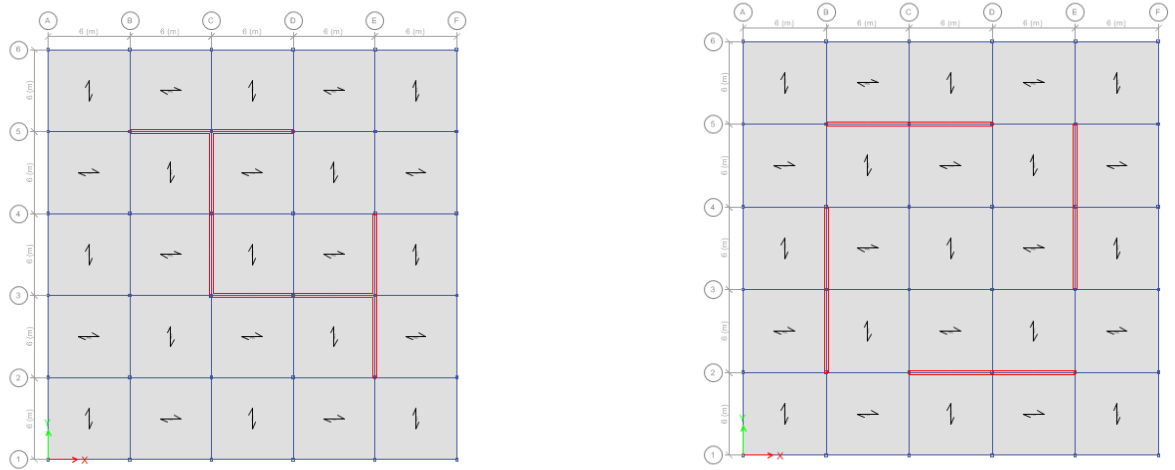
Placement of rectangular and T-shaped shear walls in the plan of a 30-story building.
